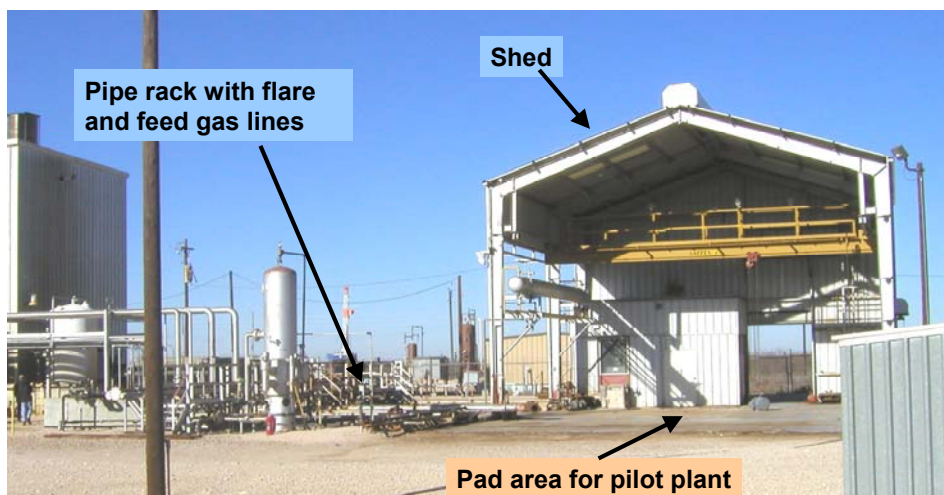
Photograph of Whiting Sable San Andreas gas plant before installation of the TDA sulfur pilot plant.
